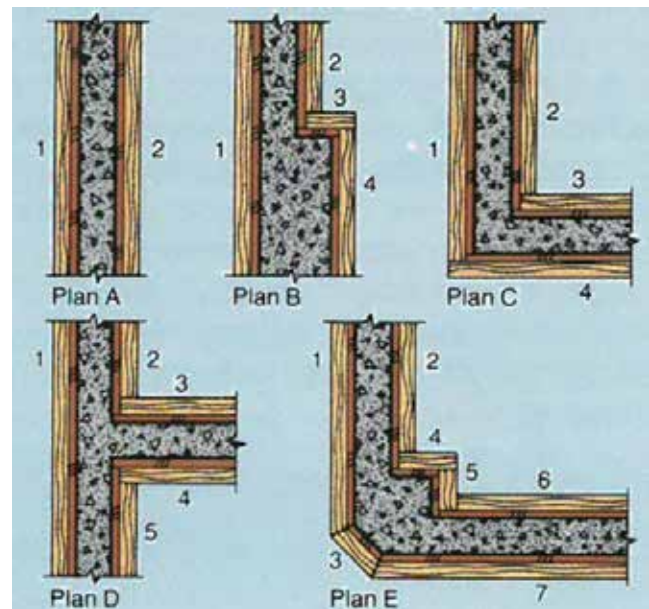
Maintain consistent planes in formed wall surfaces to optimize constructability. (Image courtesy of Ceco Concrete Construction.)
